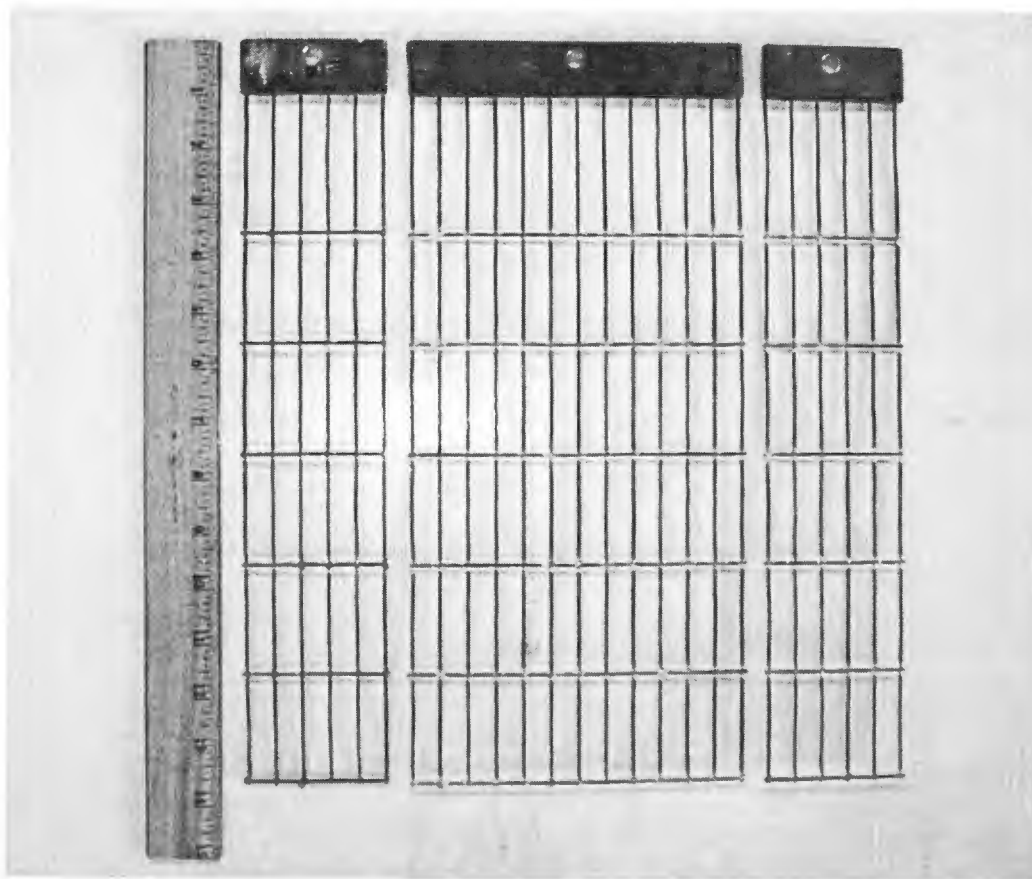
Completed scale models of welded-wire mats.
